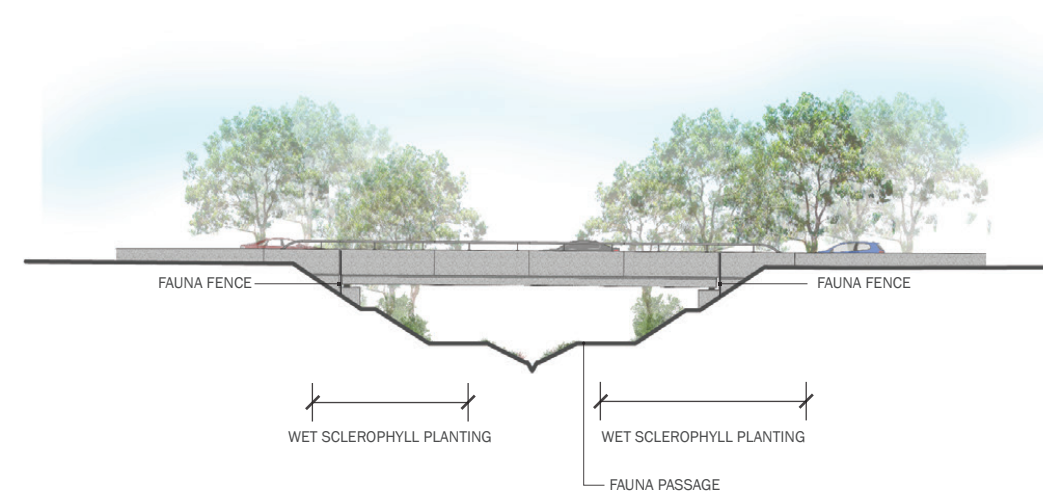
Elevation of typical fauna passage (Scale 1:400)
